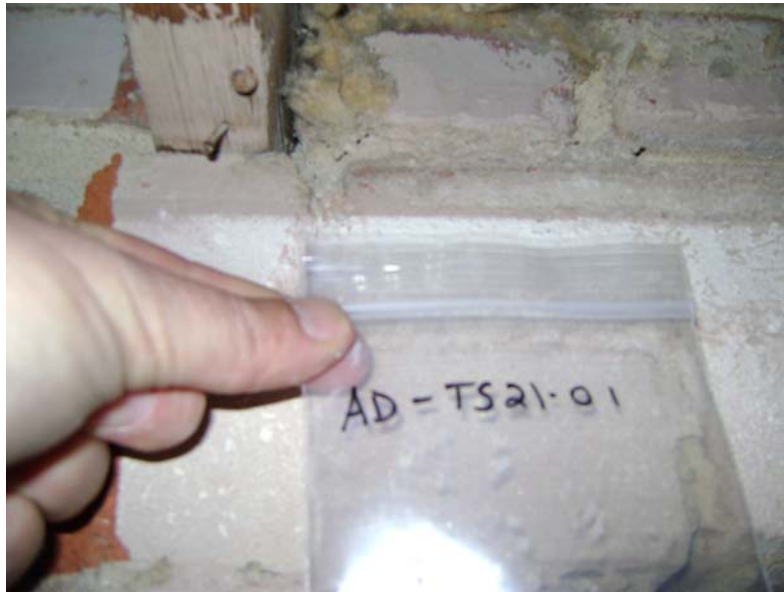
View of ceiling texture overspray on wall containing 3% Chrysotile.
